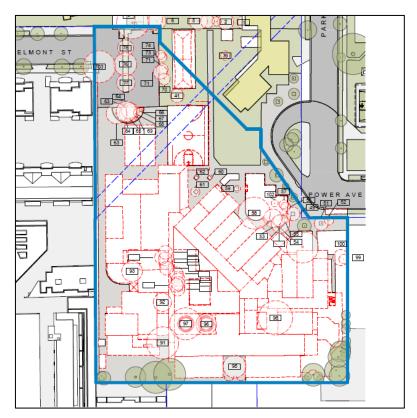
Proposed demolition plan for Phase 1 of development. (Source: TKD Architects).
